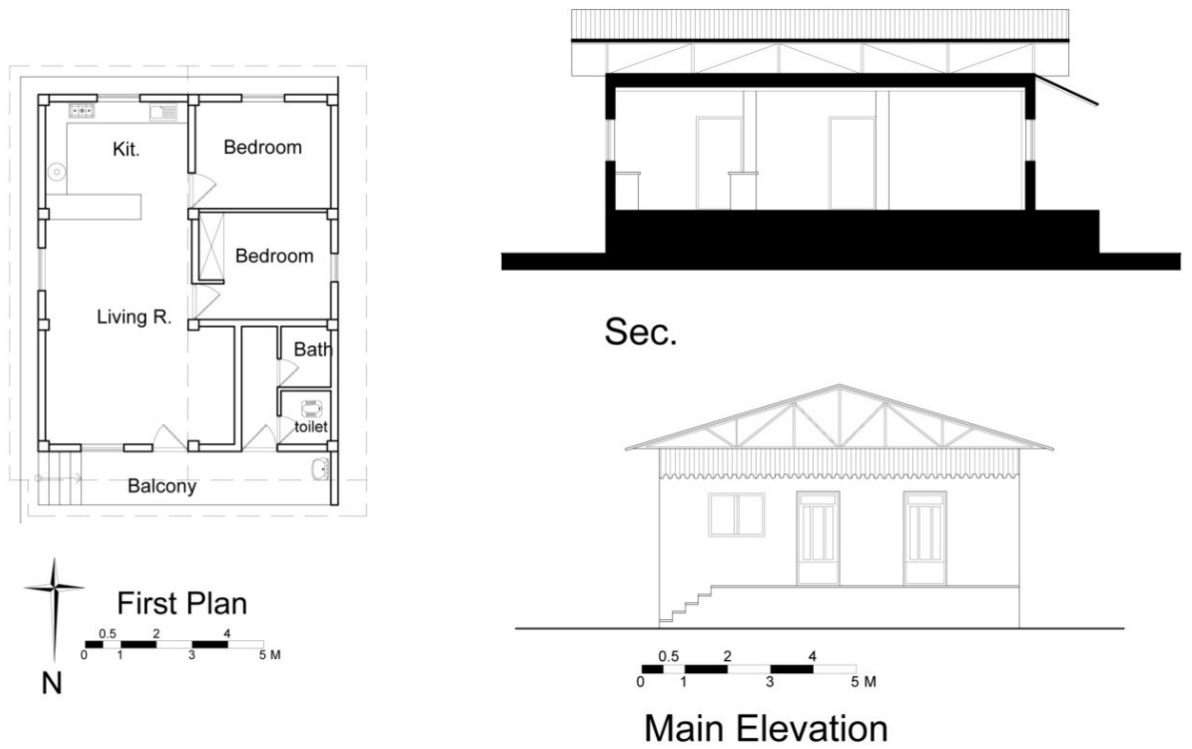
New style house (house no.9 in Diva) _ one story, concrete frame house
